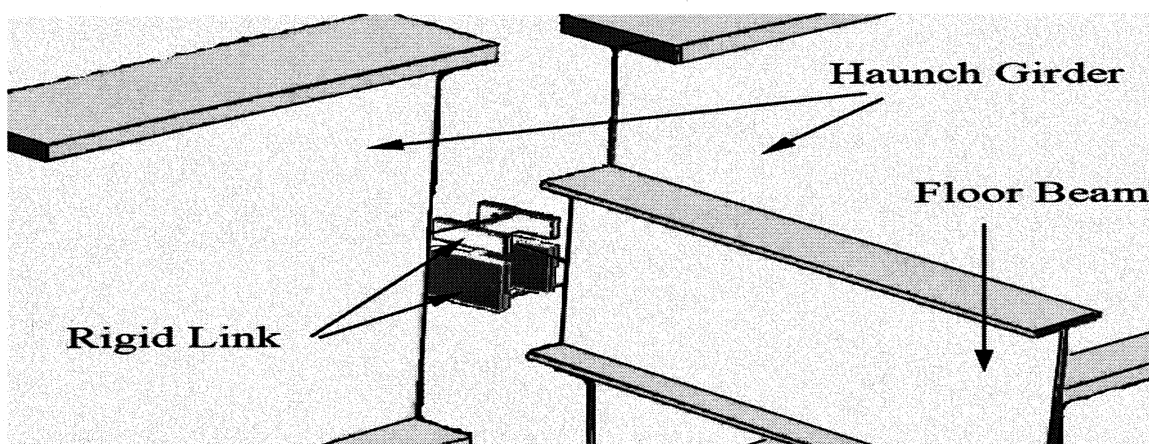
3: Rigid Link Elements at Haunch Girder/Floor Beam Intersection
